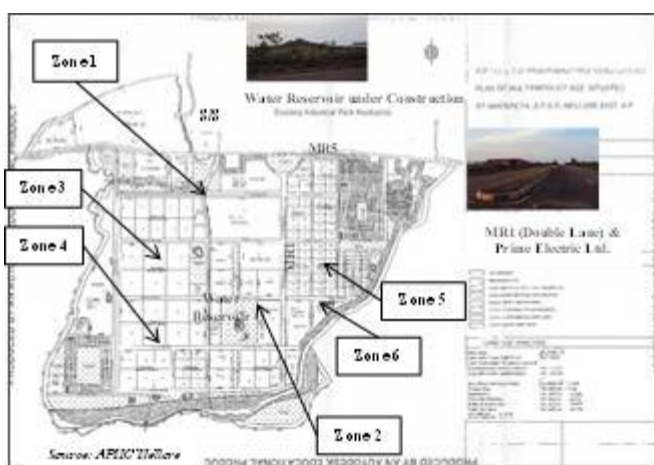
Layout Plan of Naidupet MPSEZ
